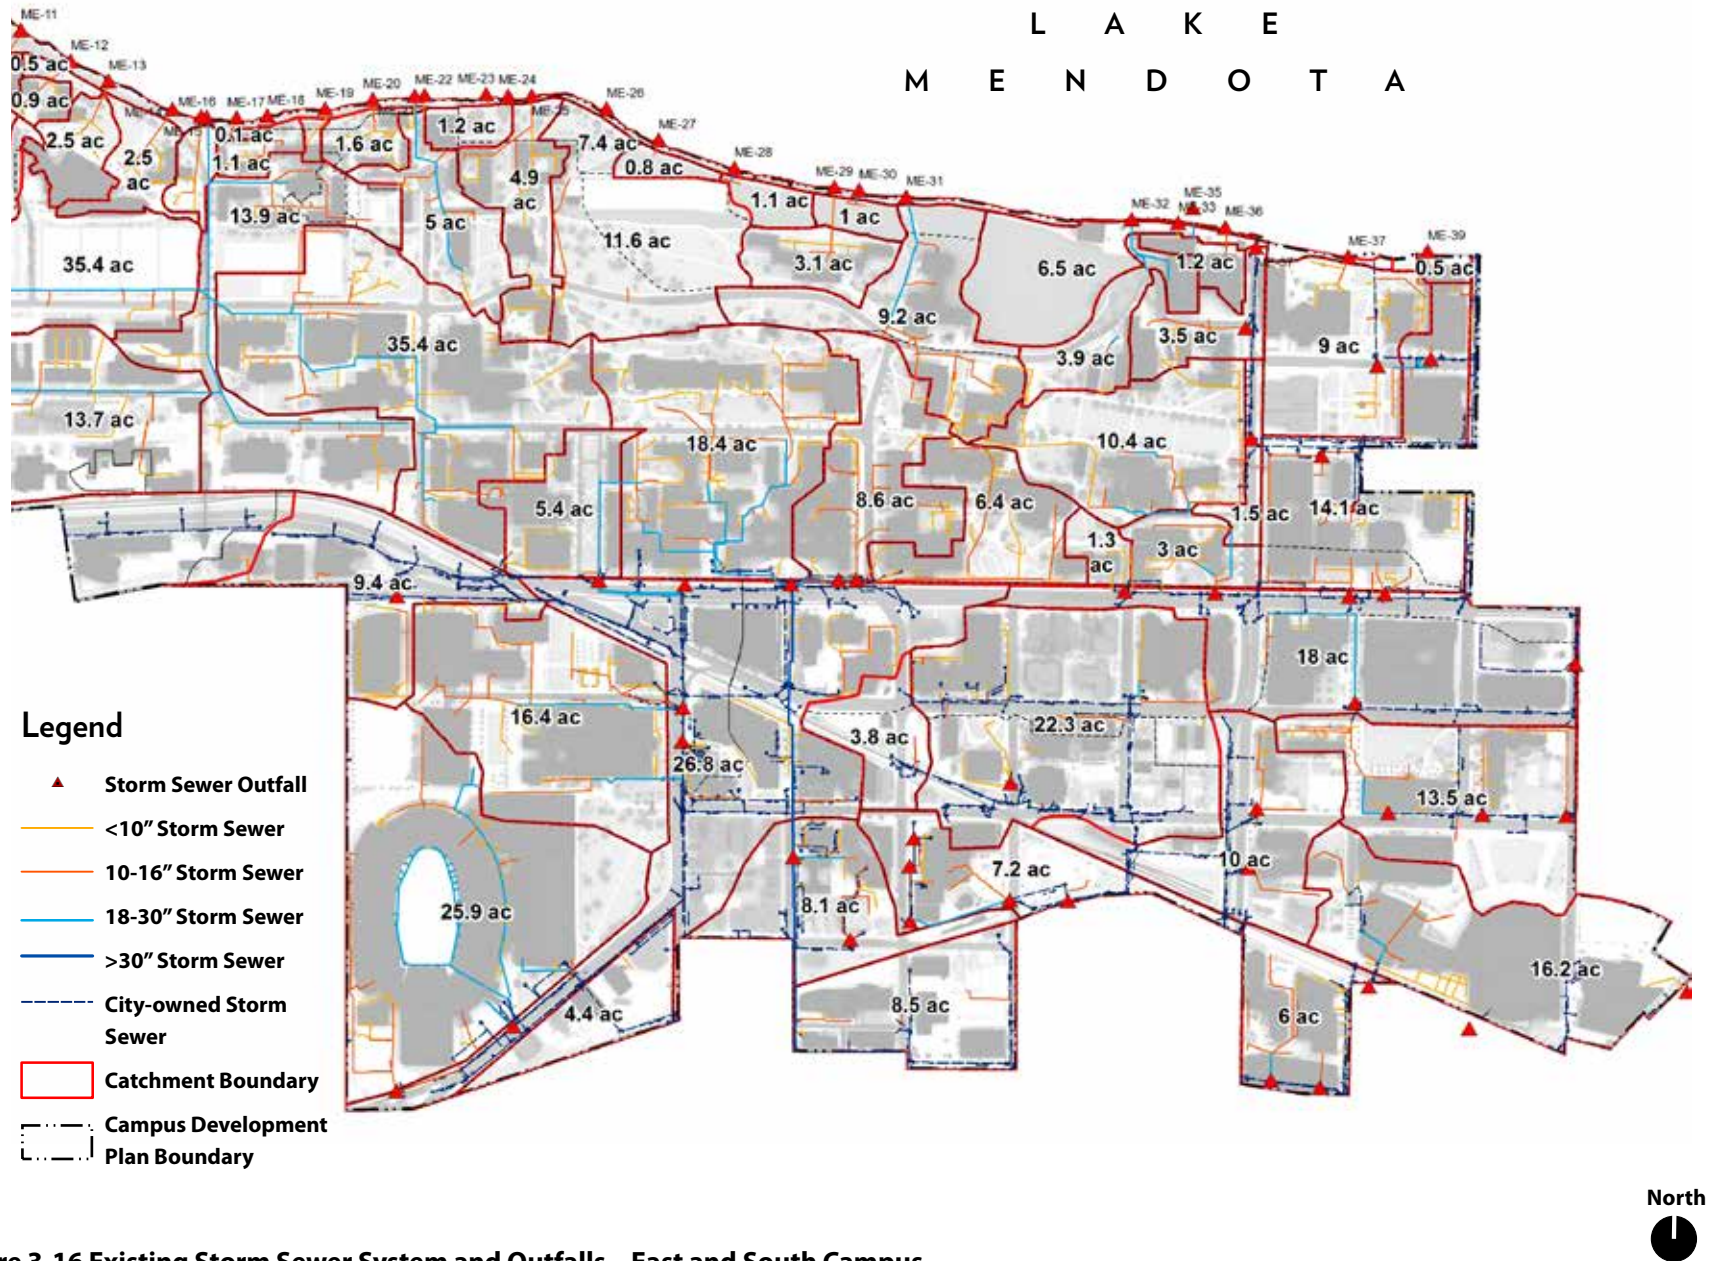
Existing Storm Sewer System and Outfalls – East and South Campus
